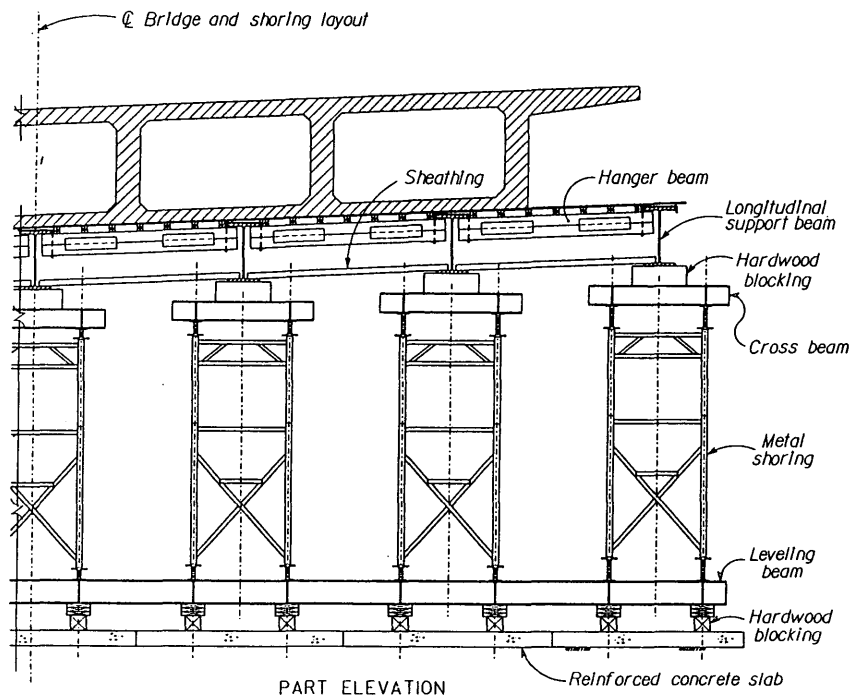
Superstructure construction for concrete girder bridge carrying Maryland Route 198 over Baltimore-Washington Parkway.
